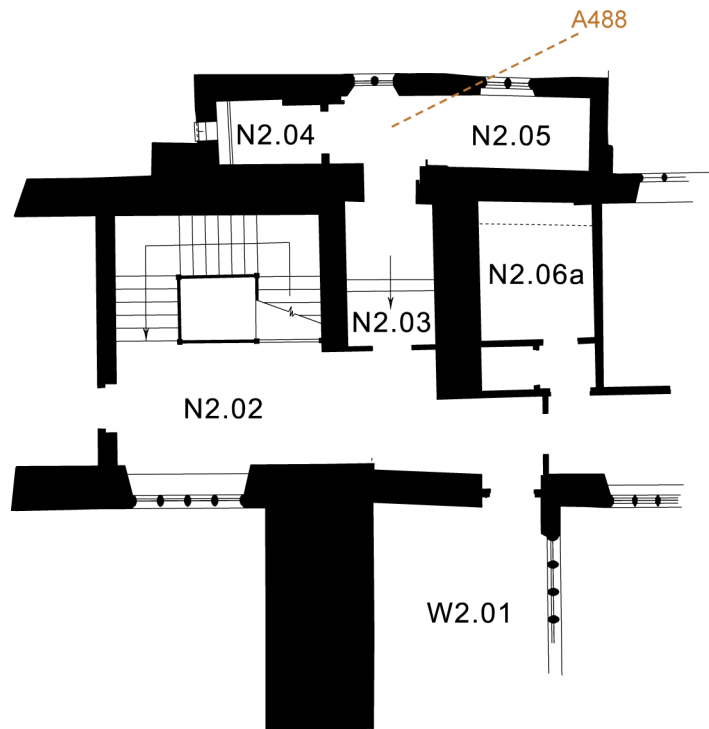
North range N2.04–05 and Archway roof W2.01, showing the location of sample APT-A488
